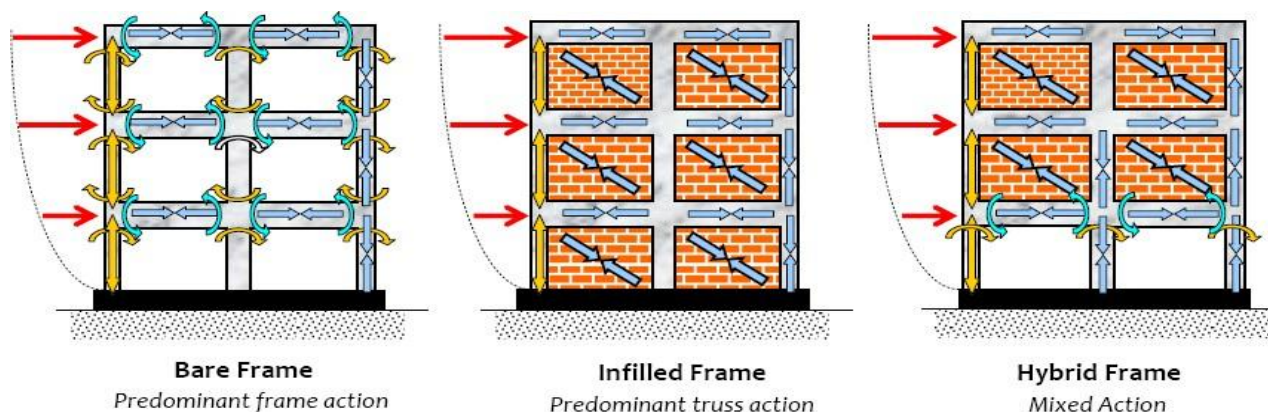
Lateral force transfer mechanism in reinforced concrete frame buildings for resisting earthquakes.
